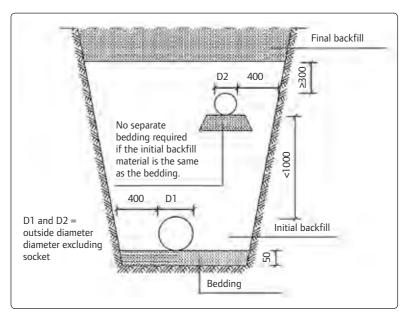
Pipe trench bedding and initial backfill, with a vertical free distance of < 1,000 mm between pipes.
